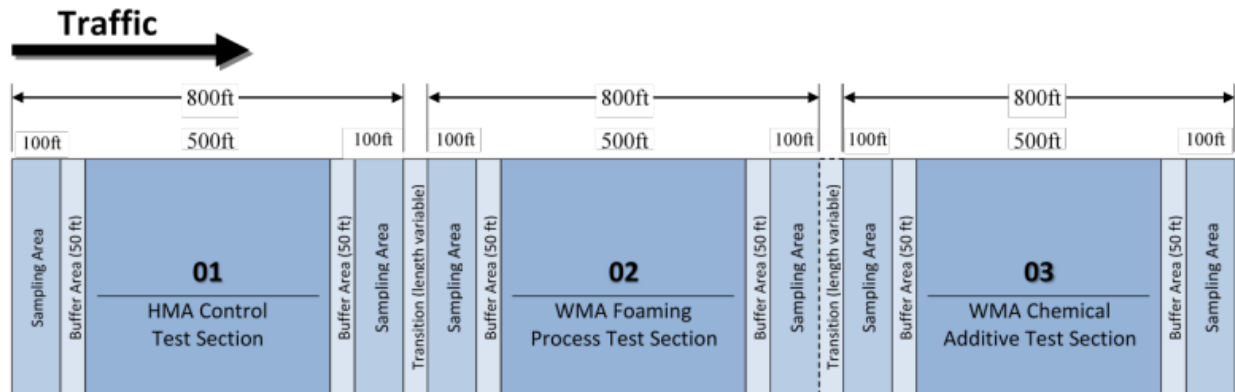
Diagram of a Typical SPS-10 Site Layout (Puccinelli et al., 2023).
